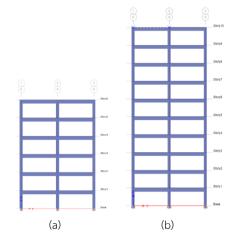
The side view of (a) 6 story building and (b) 10 story building.
